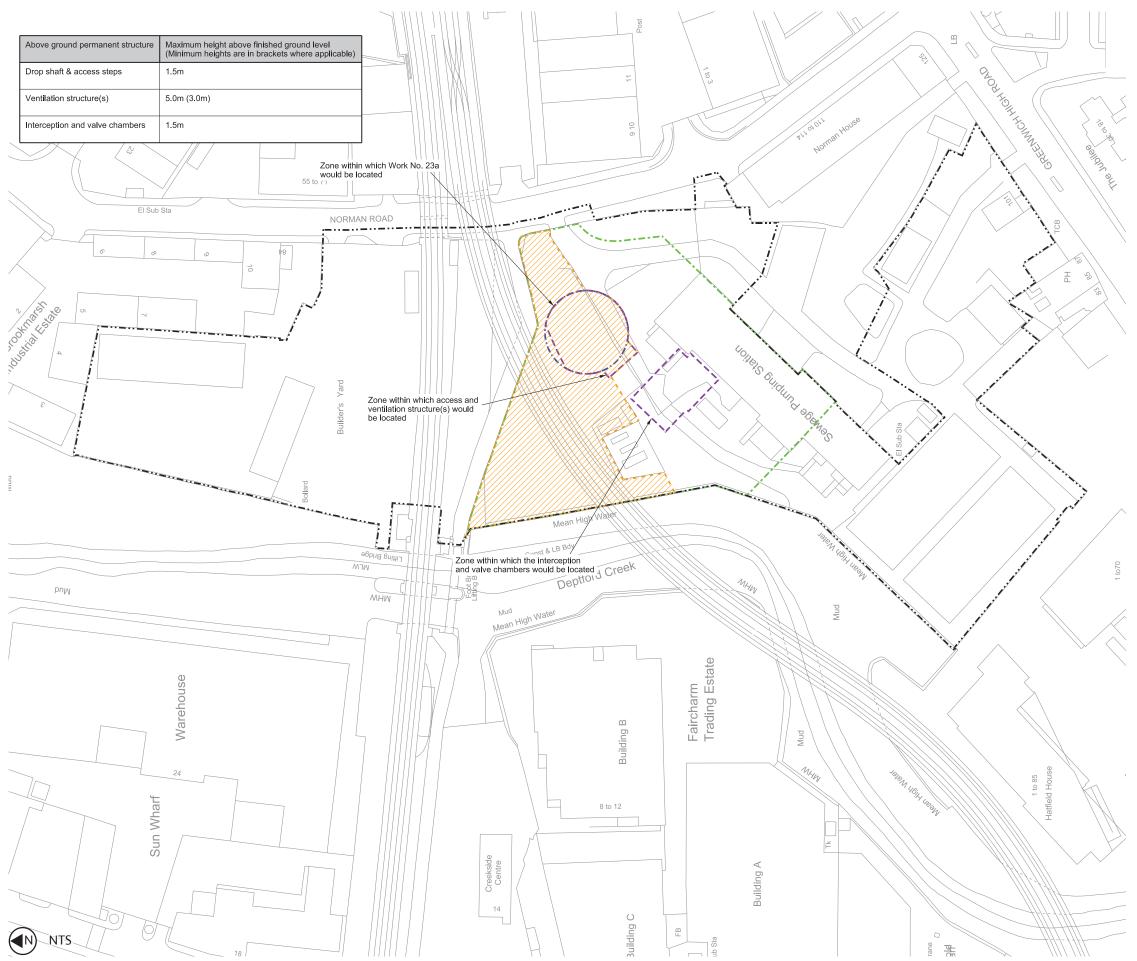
Site works parameter plan - refer to Site works parameter plan in the *Book of Plans
